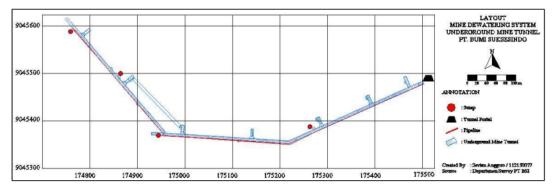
The layout of Mine Dewatering System in the Tunnel.
